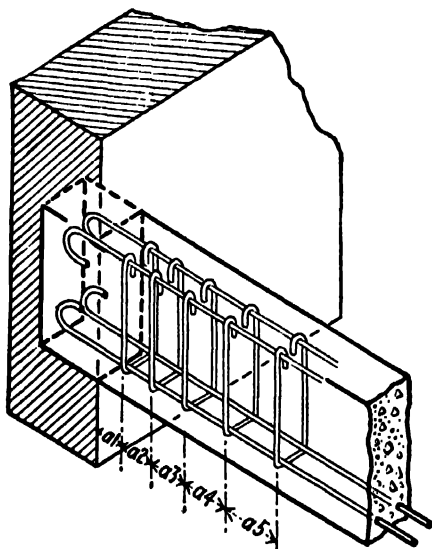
Typical reinforced concrete beam; principal longitudinal bars bent up in single plane.
